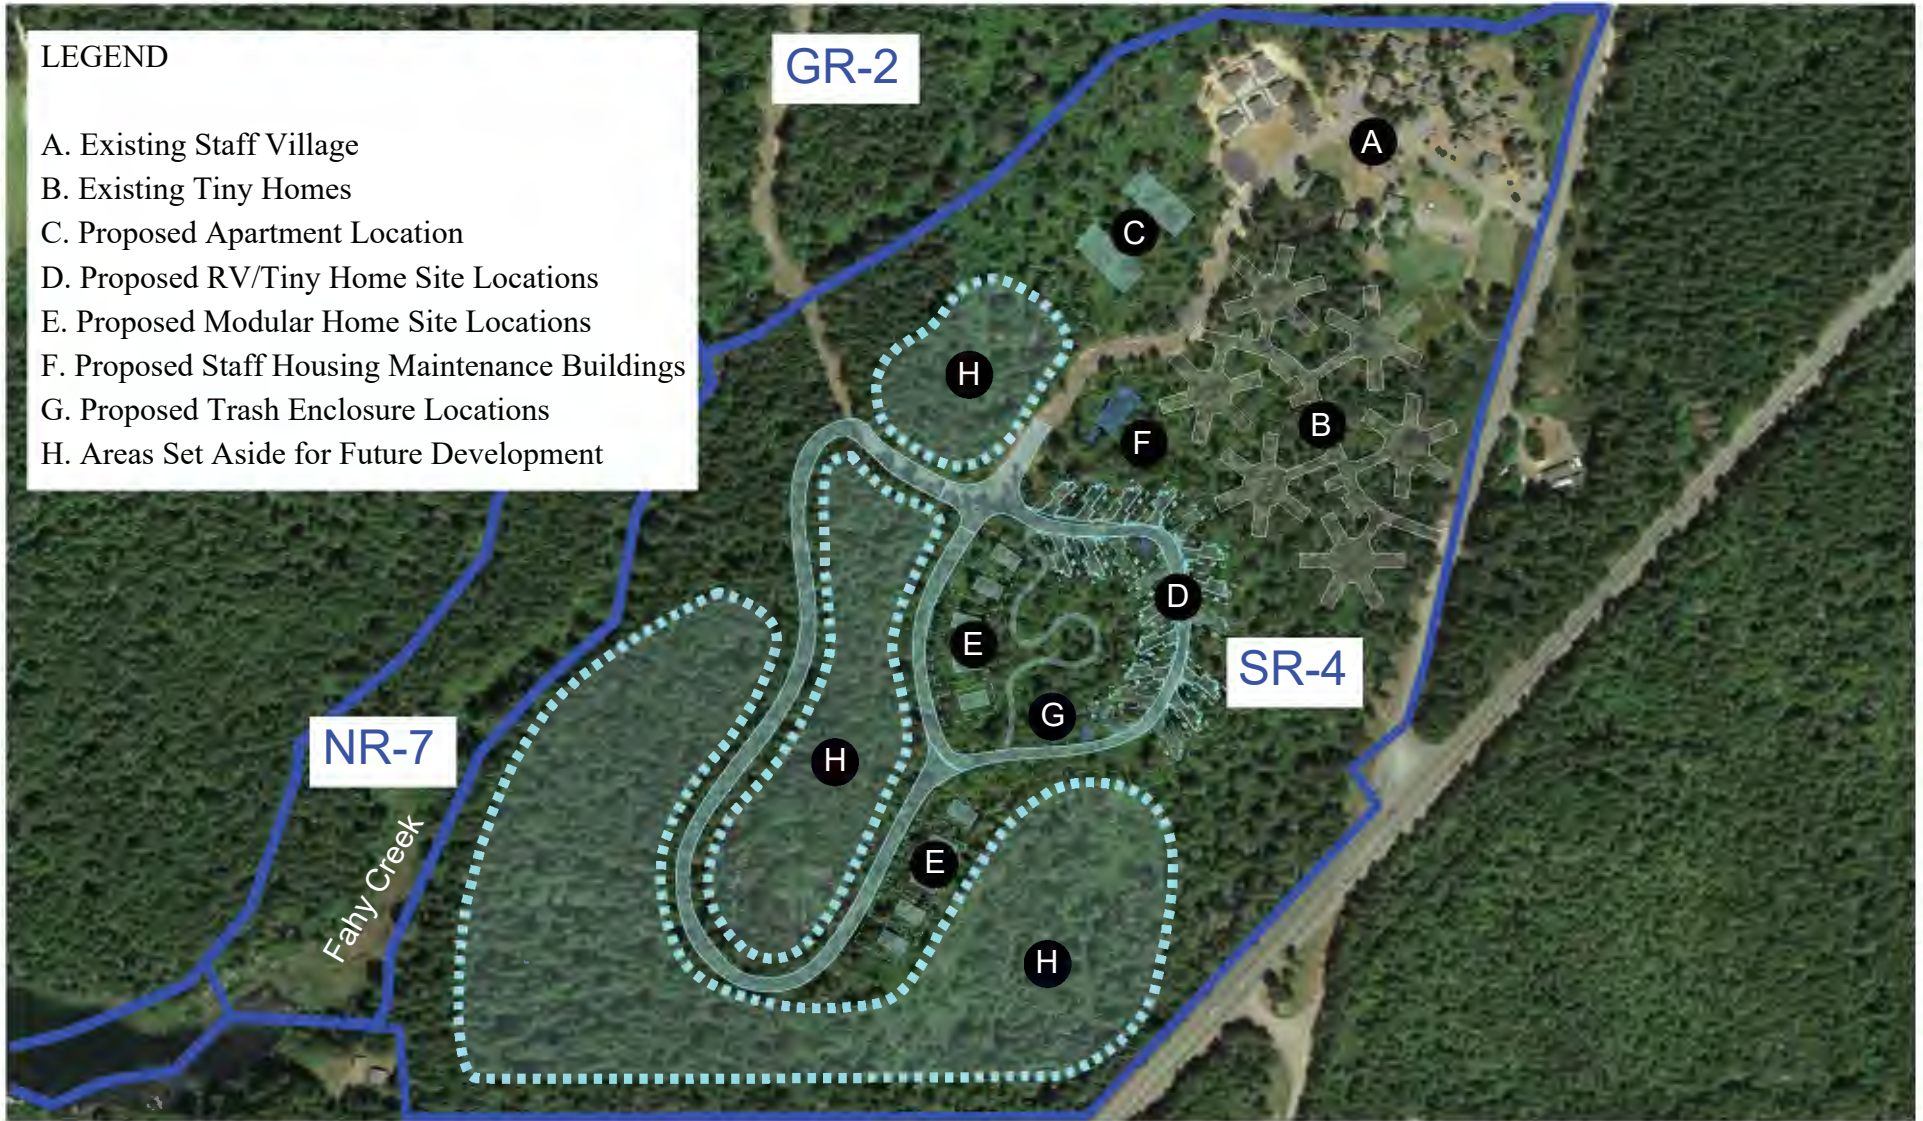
STAFF HOUSING EXPANSION MASTER SITE PLAN
